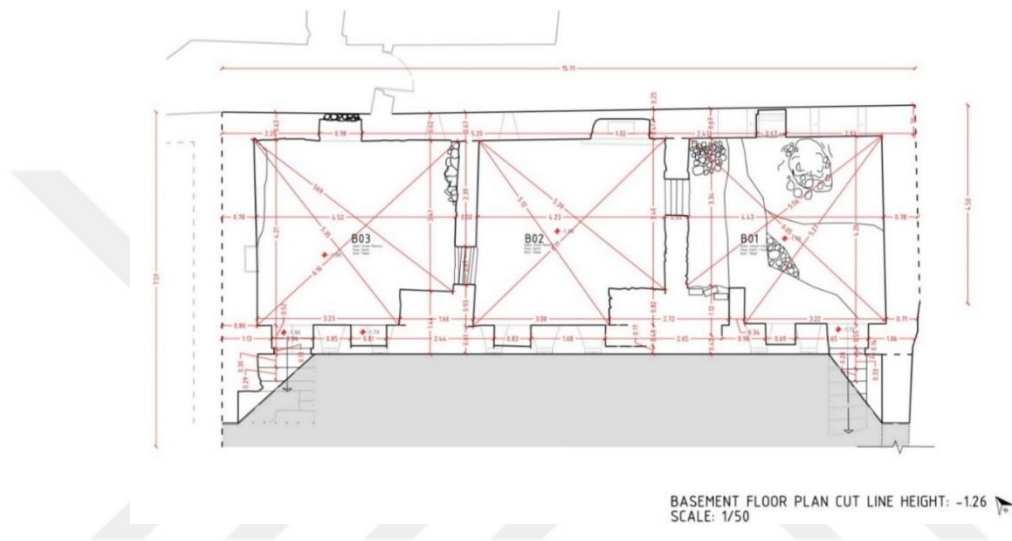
Basement floor plan - cut line height: -1,26m (METU CONS, 2019)
